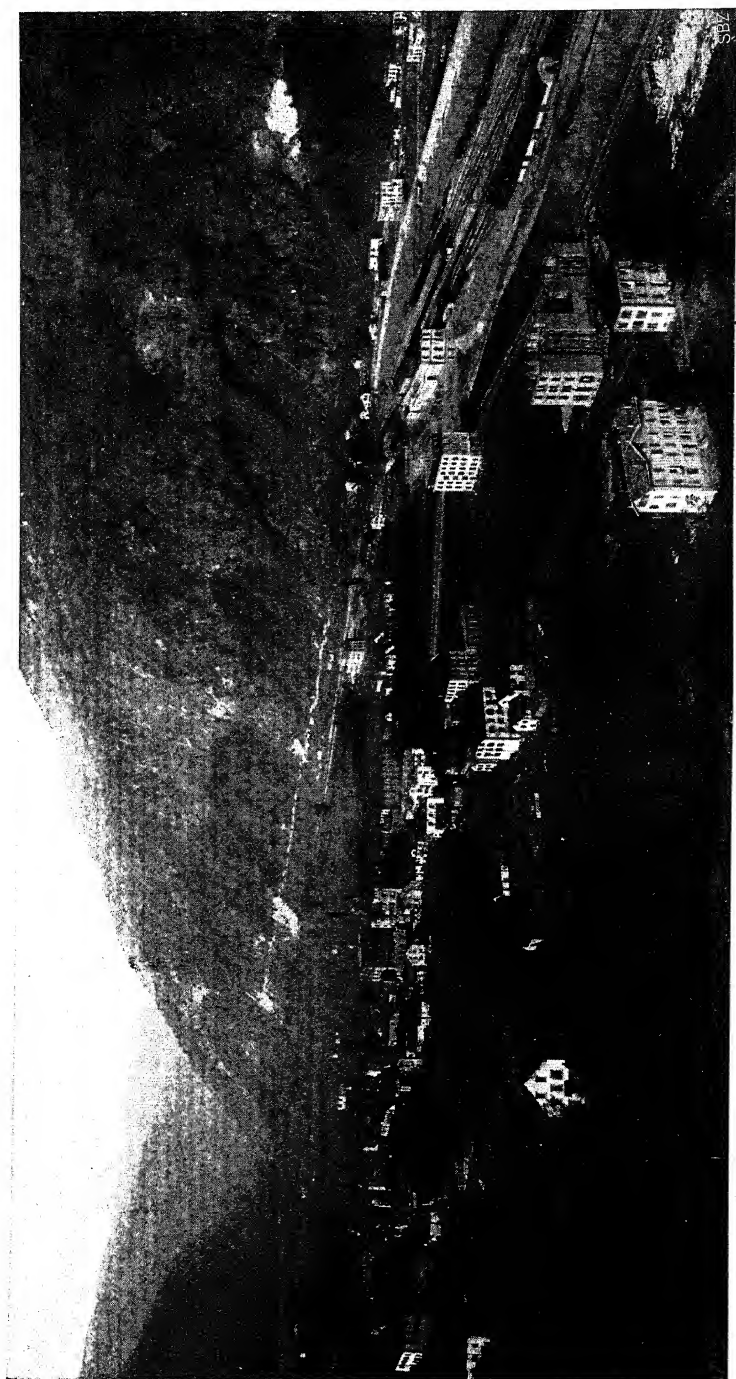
VIEW FROM BRIGUE OF THE LOWER PART OF THE LOETSCHBERG RAILROAD (UNDER CONSTRUCTION).
